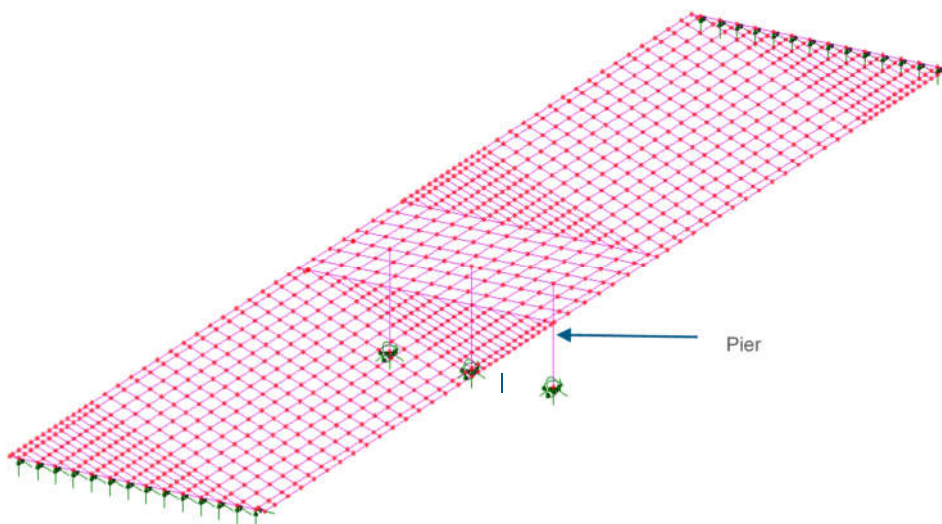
Hocombe Bridge Structure Idealisation – Isometric view
